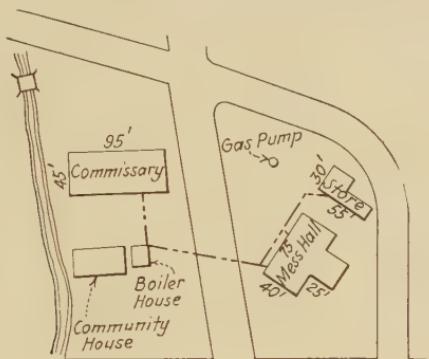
Central heating and camp layout at Taylorsville dam.
